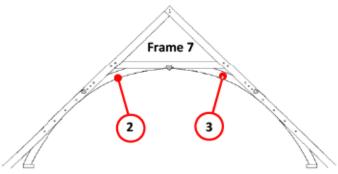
The chancel roof trusses to show sampled timbers (after Baart Harries Newall, Architects, Shrewsbury)
